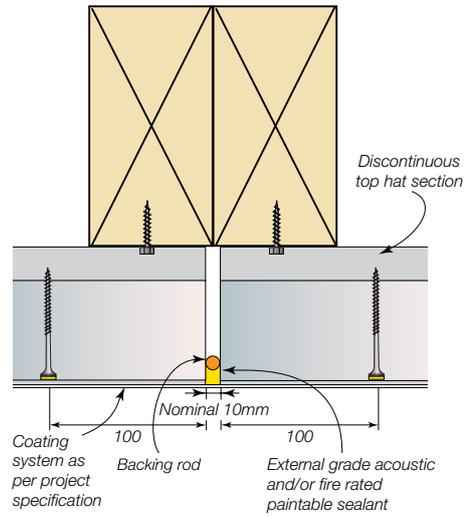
Horizontal control joint – Brick veneer to STAAC WALL® - Option 2
